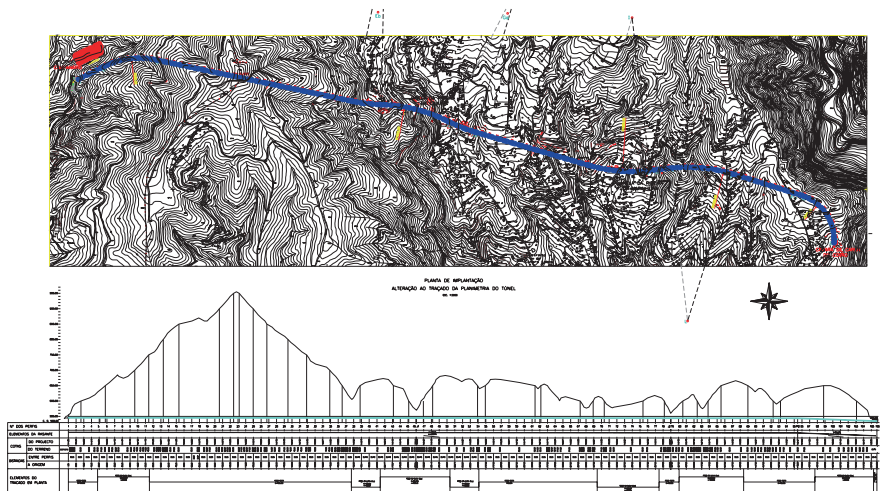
Plan and longitudinal cross section of Covão tunnel (Cafofo and Sousa 2007)
